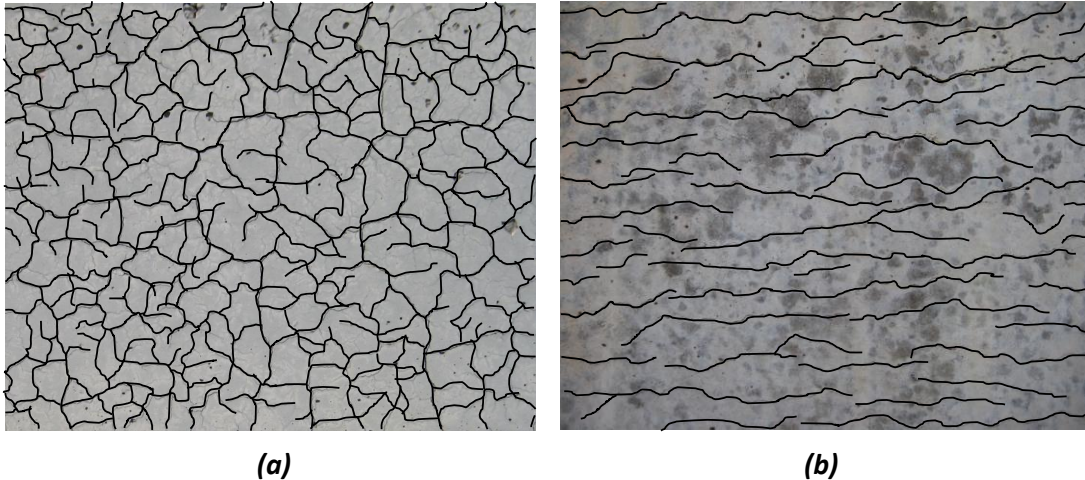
Crack Patterns for (a) Unreinforced Element and (b) Reinforced Element with Primary Reinforcement in the Longitudinal Direction
